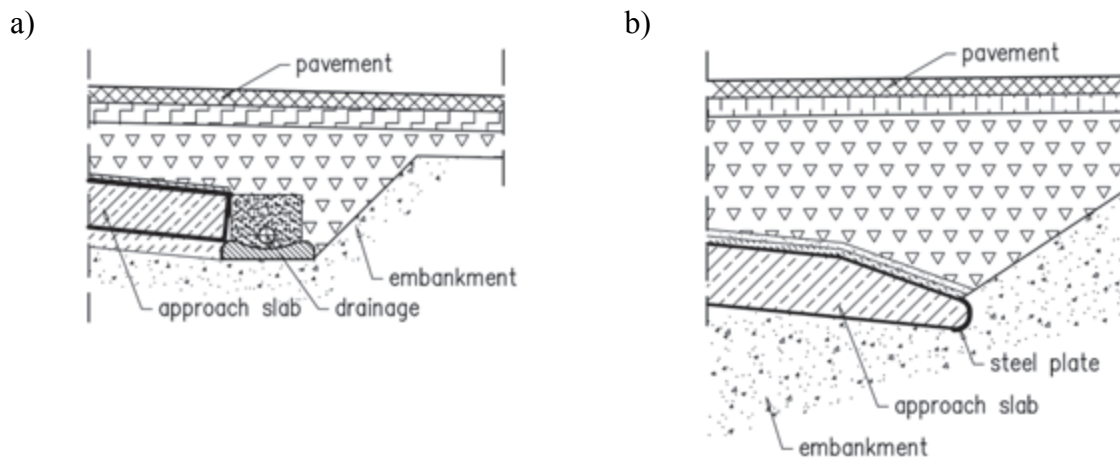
Typical approach slab end (a) and sharp slab end (b) in mining damage areas
